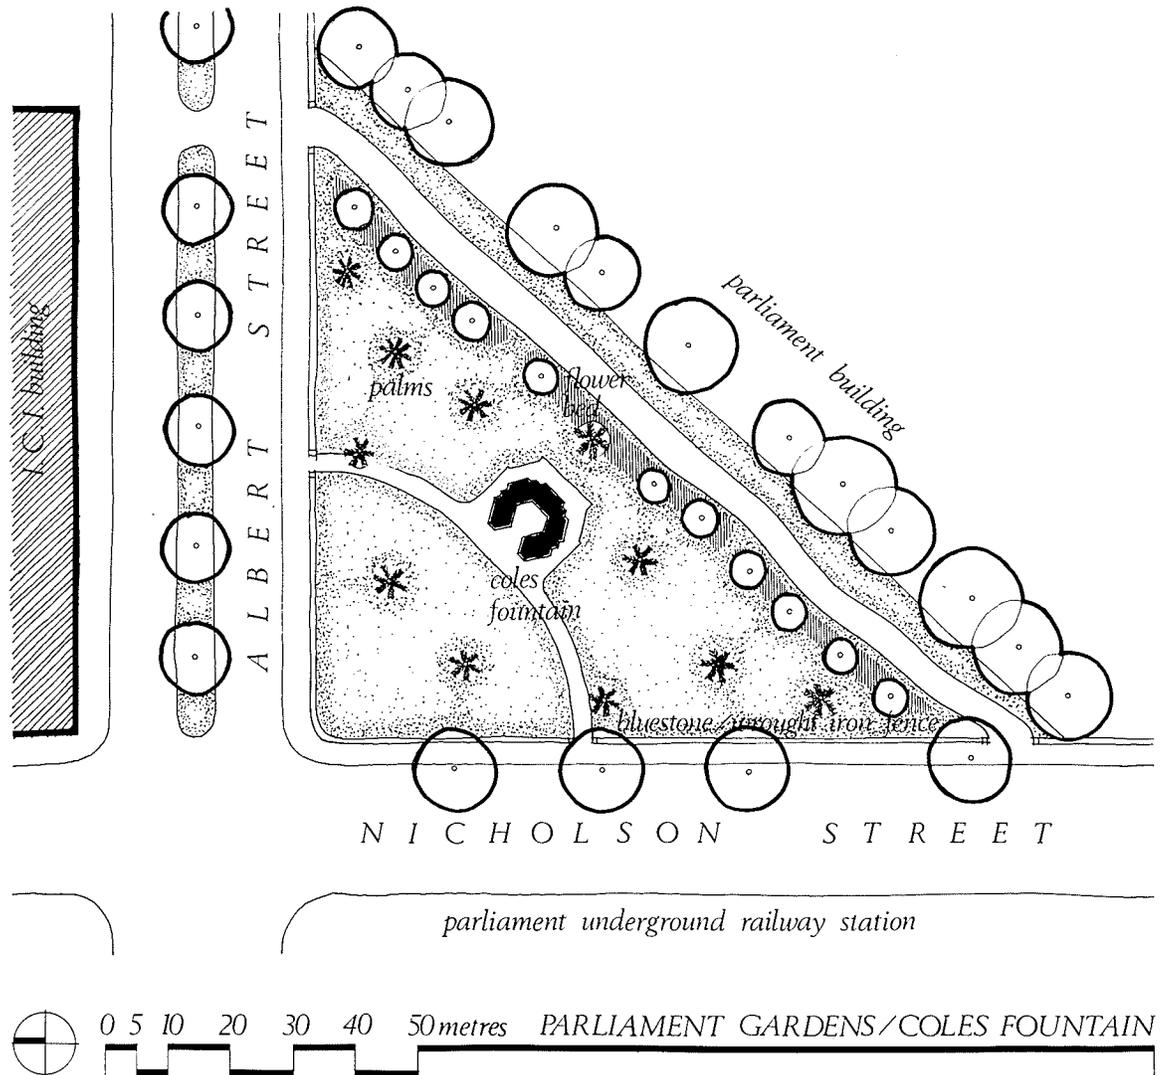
Parliament Gardens/Coles Fountain -- Site Plan.
